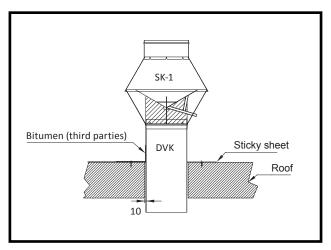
Aluminium roof shaft cowl with demountable U-frame.
